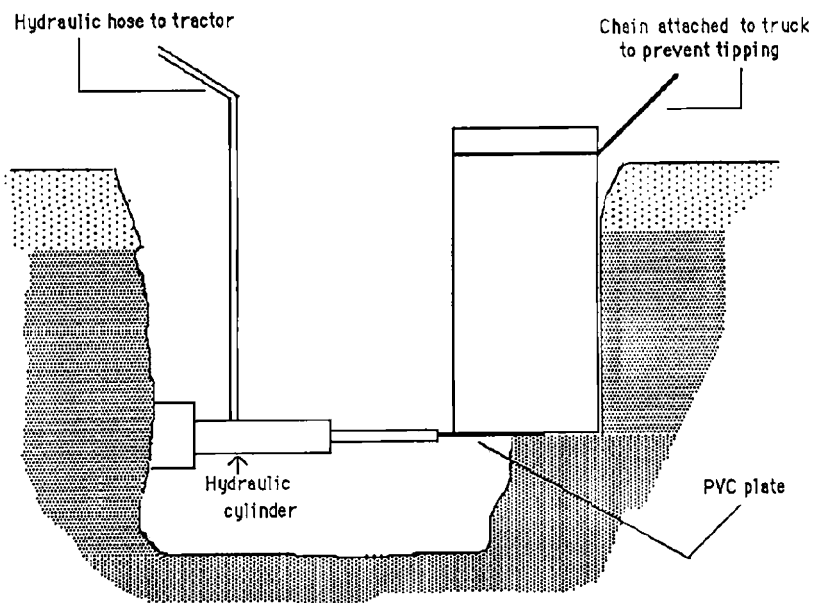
Tractor mounted hydraulic cylinder used for installation of PVC plate at bottom of pipe.
